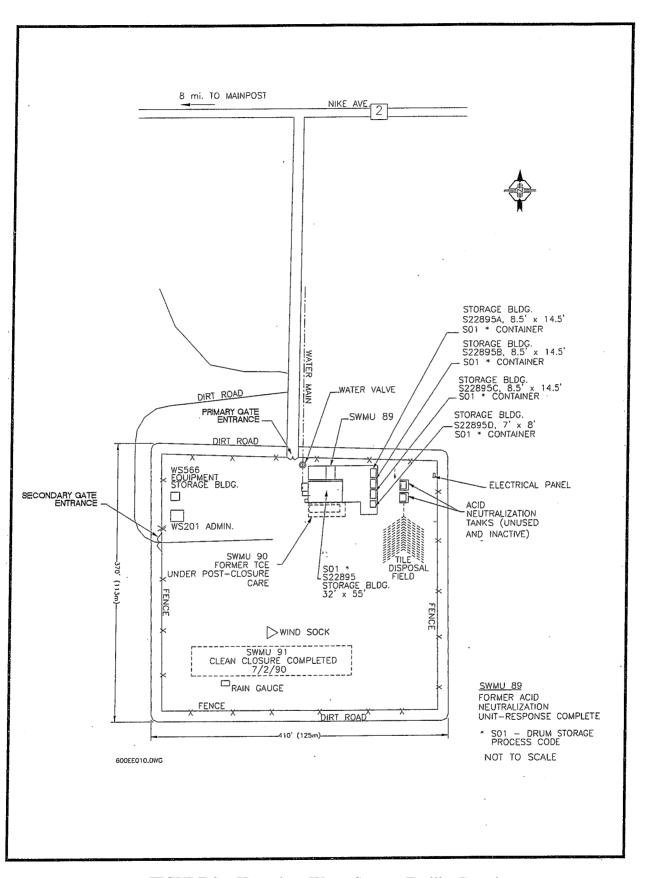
Hazardous Waste Storage Facility Drawing
